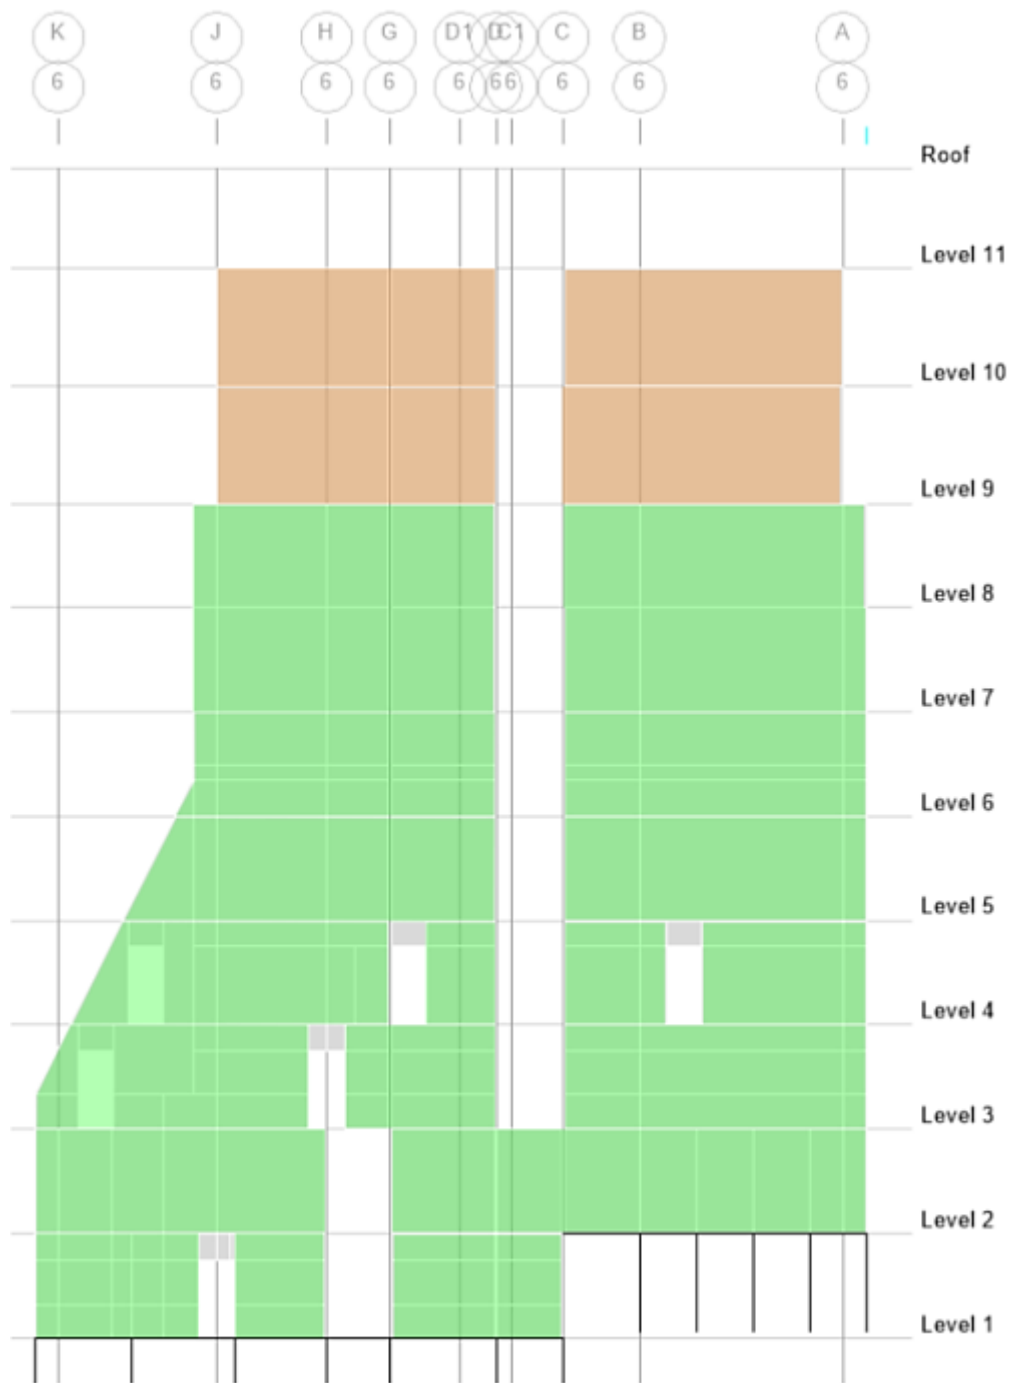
, Gridline 6 Transverse Direction Wall – North Structure
